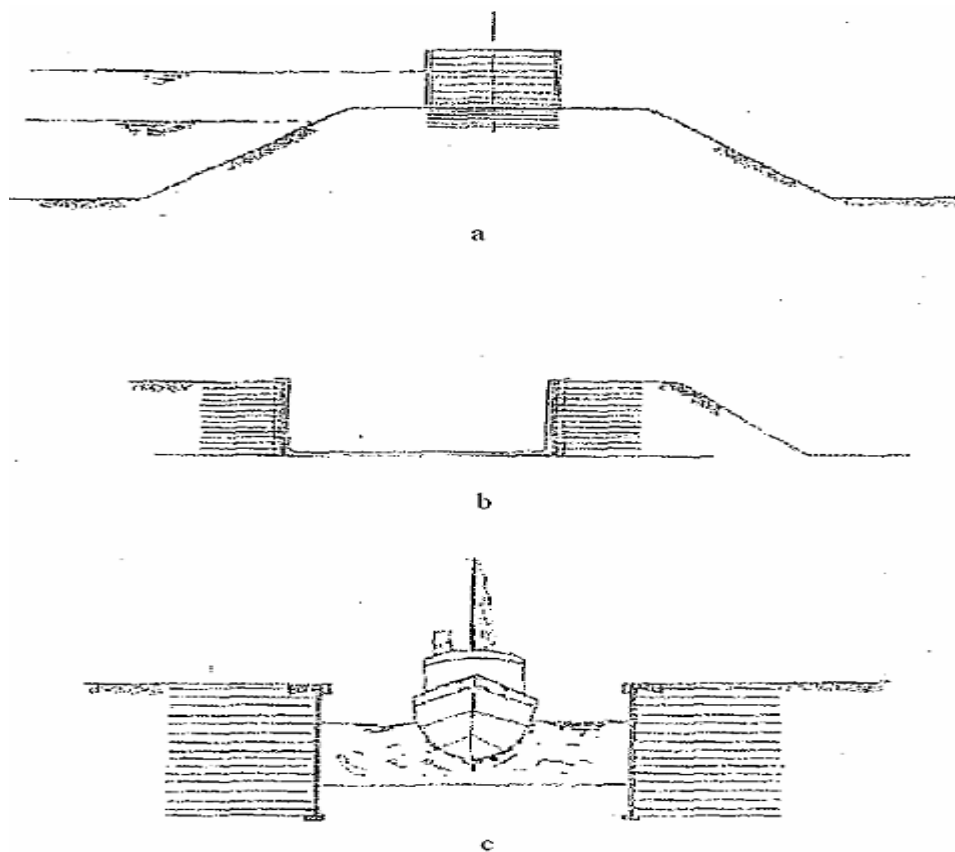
Special applications of reinforced earth retaining structures (Craig, 1987)
